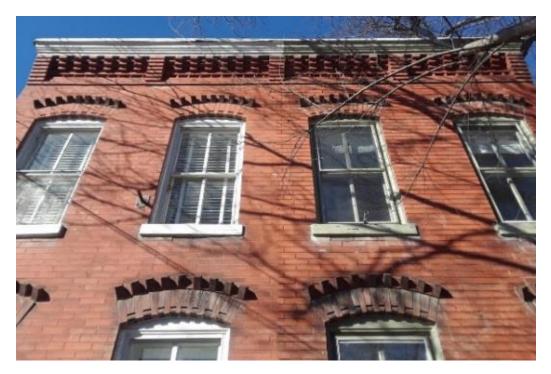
Second floor windows, front façade (115 & 117 South Fayette Street)
